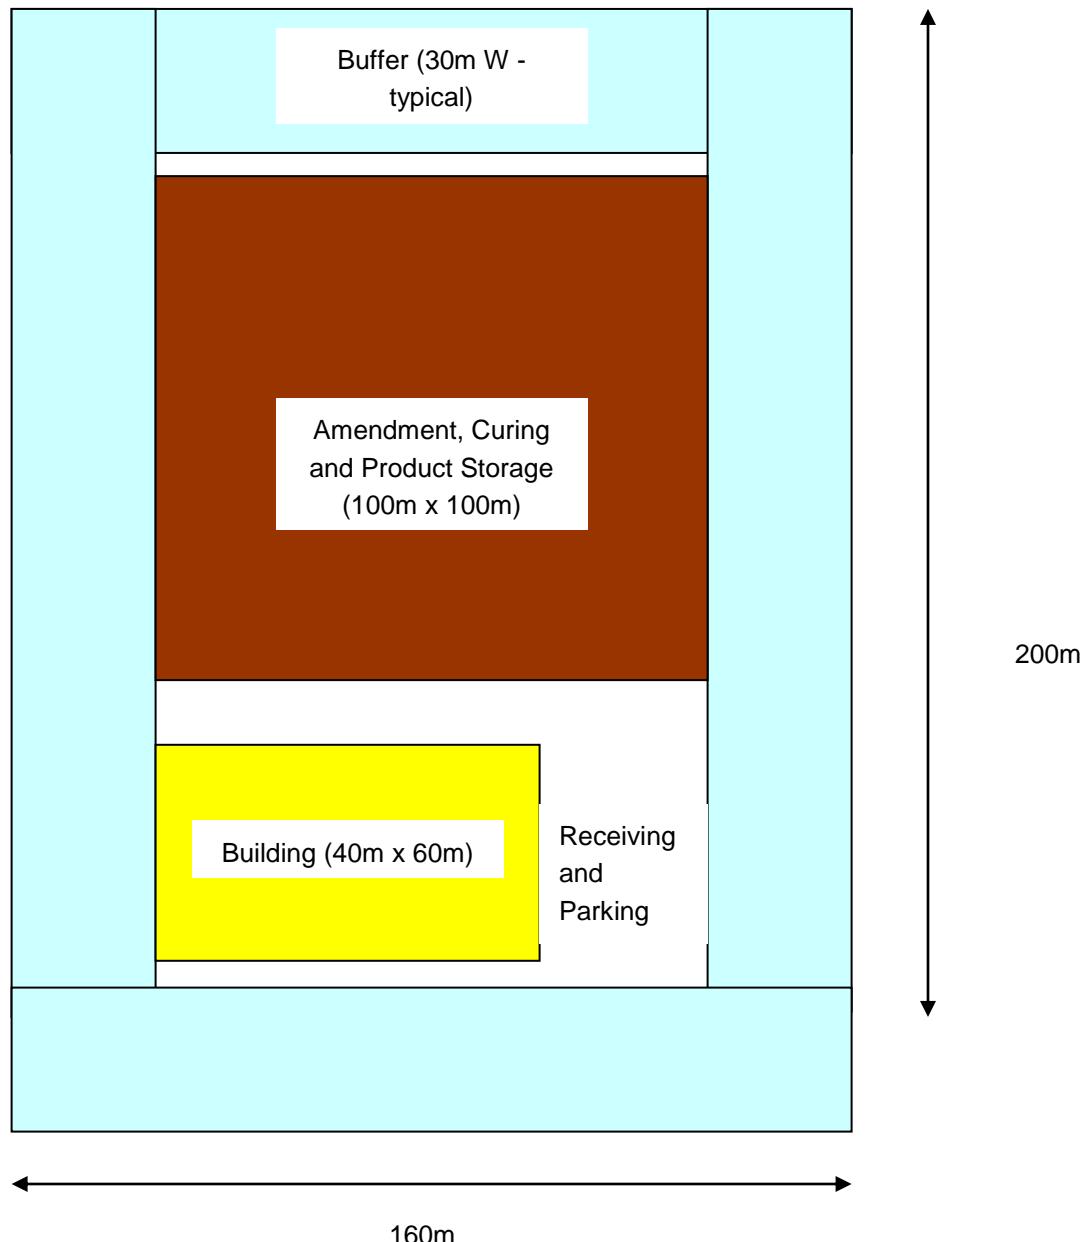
(b) Conceptual Site Plan of Composting Facility
